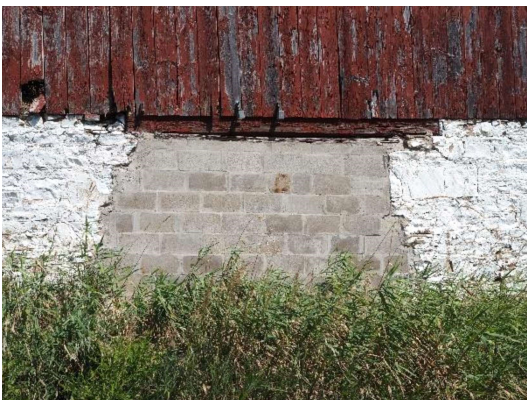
Stone foundation with concrete block repair, south façade, looking north
